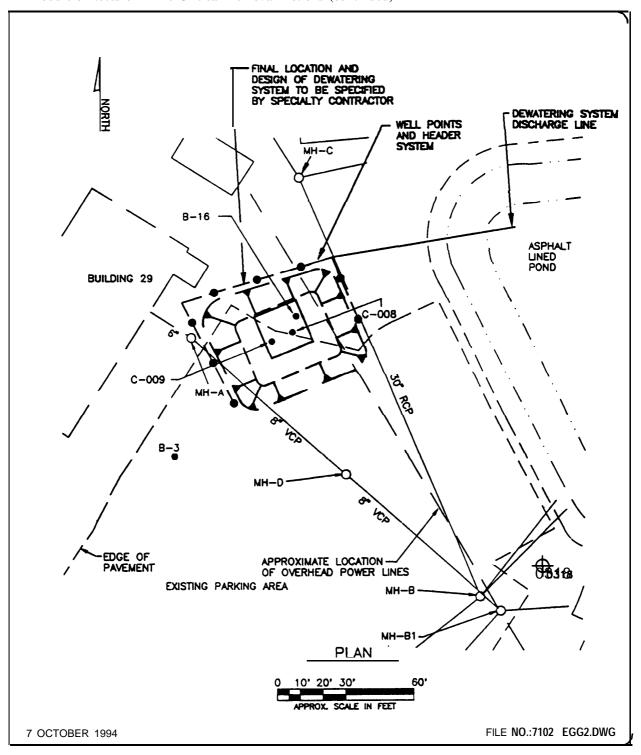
Conceptual Layout of Excavation Dewatering System
